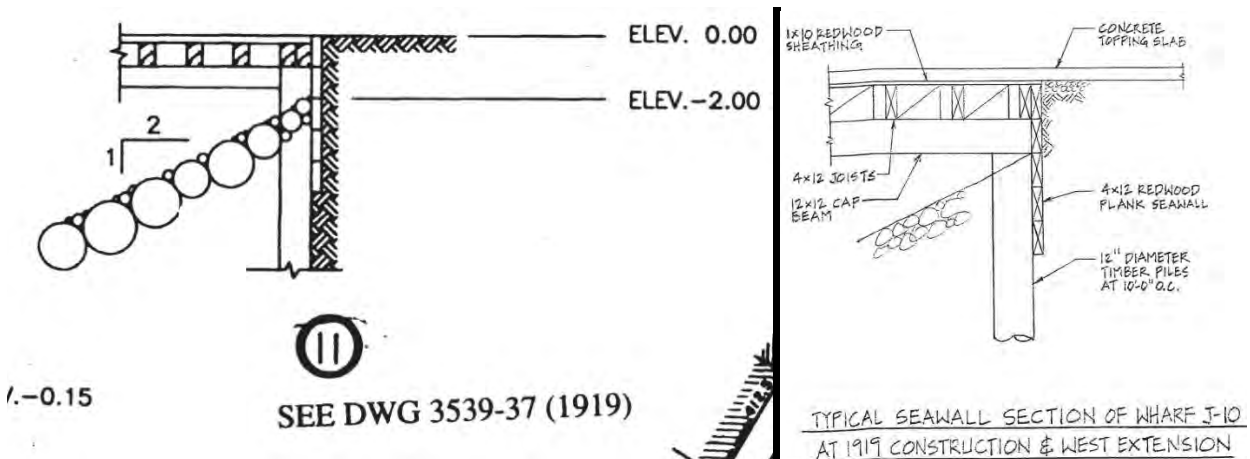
Seawall Section FW, Bulkhead Wall Type 11
